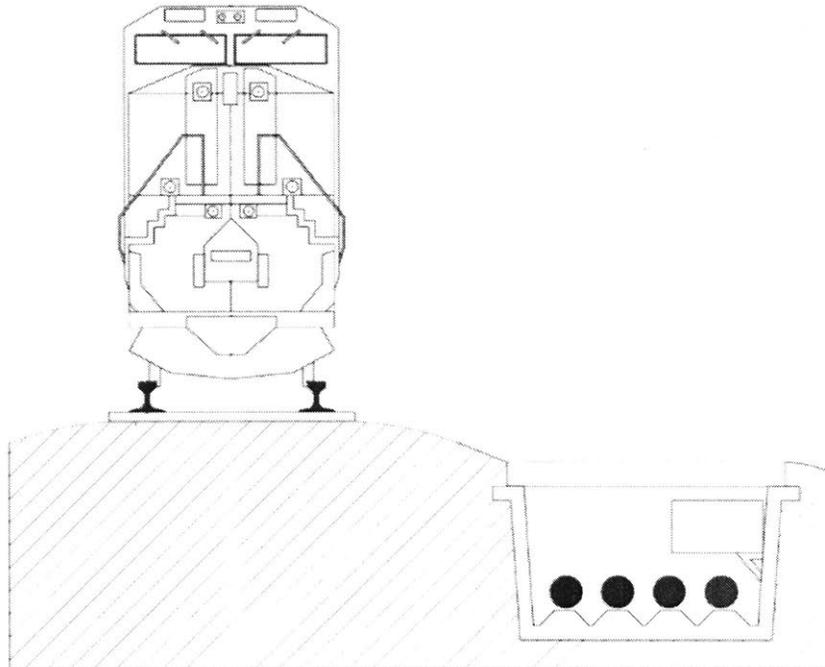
A concept for a trackside, open-air cable gallery with a slip-formed concrete trench and precast concrete cover.
